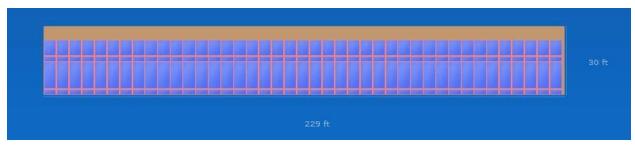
Elevation view of curtain wall system modeled in COMFEN
